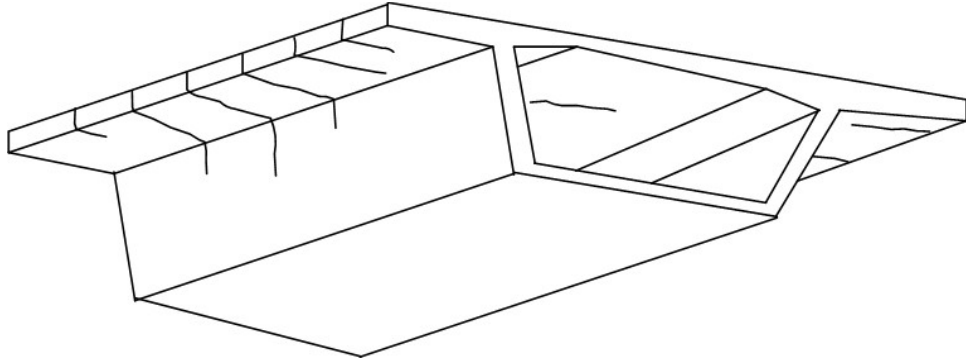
Box Girder Cracks Induced by Flexure (Negative Moment)
